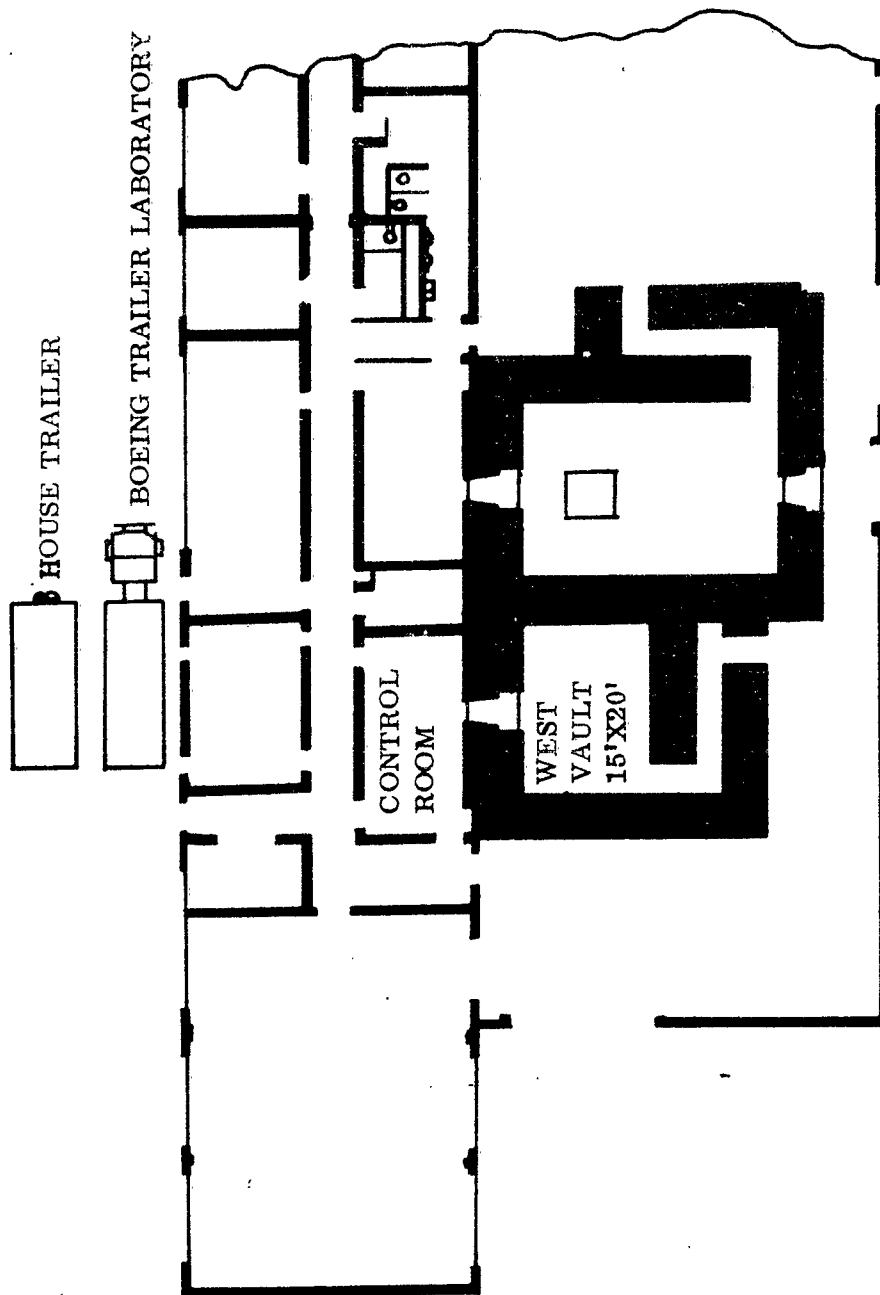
Section of Building 110 Showing West Vault, Control Room and Trailer Location.
